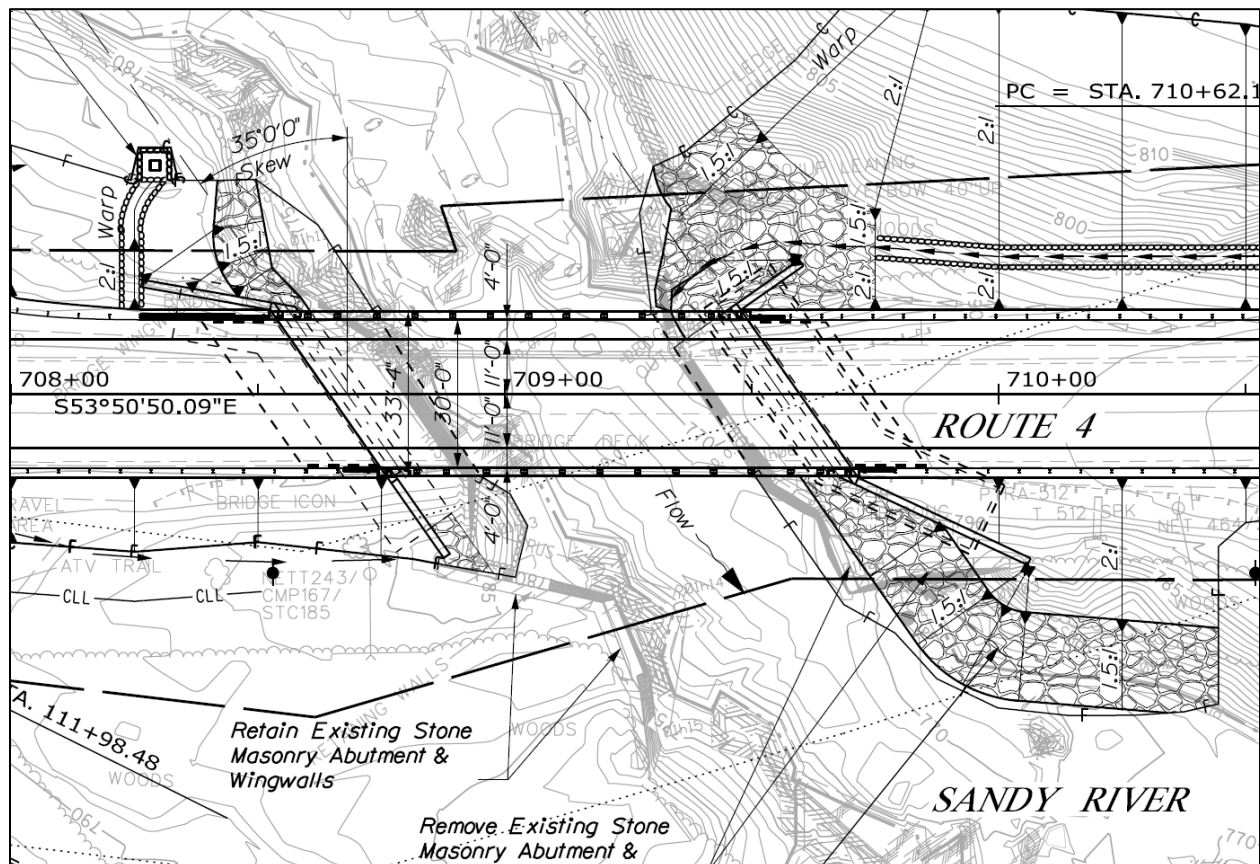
Proposed Bridge Design: Note: Easterly Old Stone abutments to be removed, westerly stone abutments to remain.
